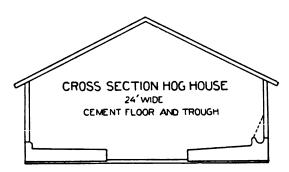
CONCRETE FLOOR FOR HOGHOUSE.
